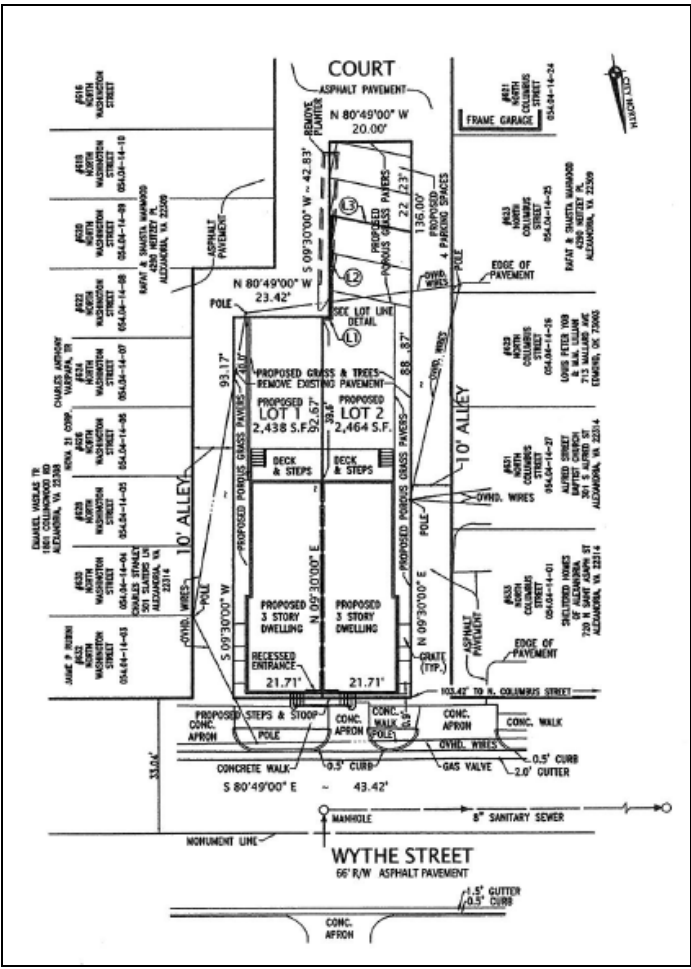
Plat showing subdivided lots and location of proposed dwellings.
